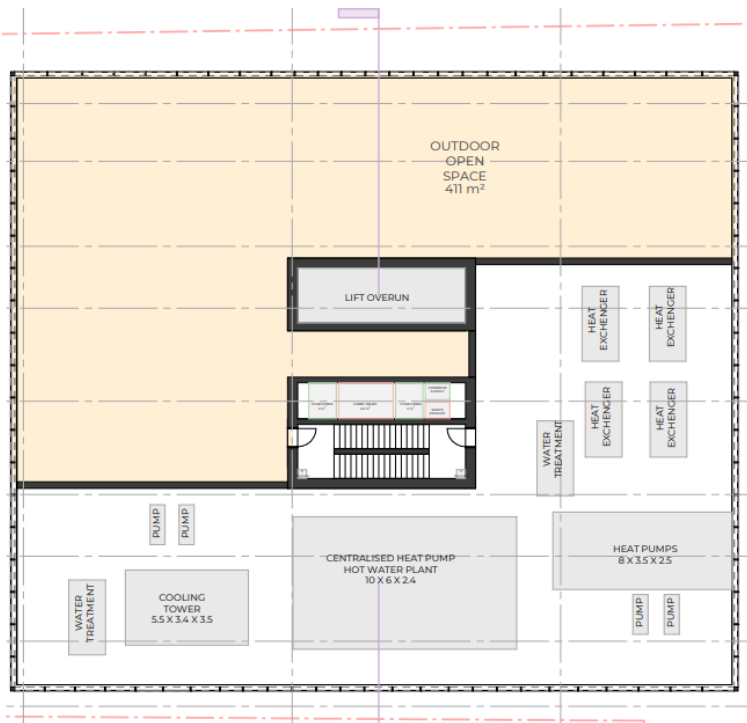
Indicative roof top plan BTR towers (Source: Woods Bagot, Major Projects Portal)
